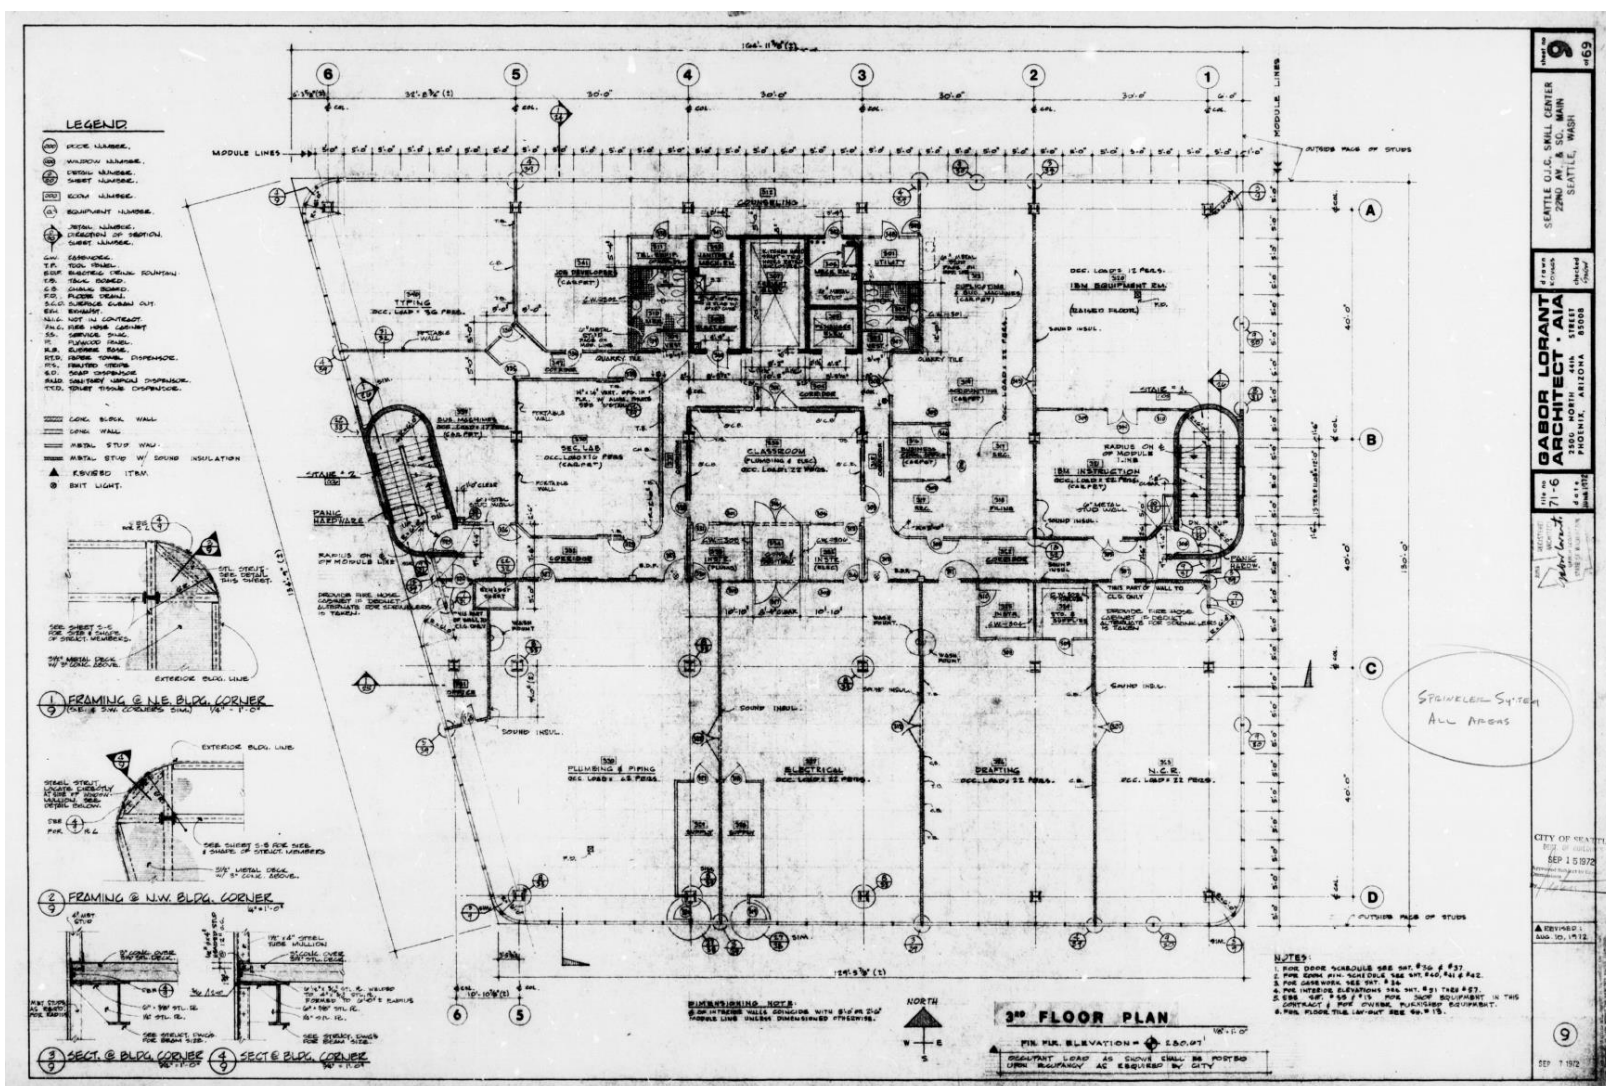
Third Floor Plan by Gabor Lorant, 1972
